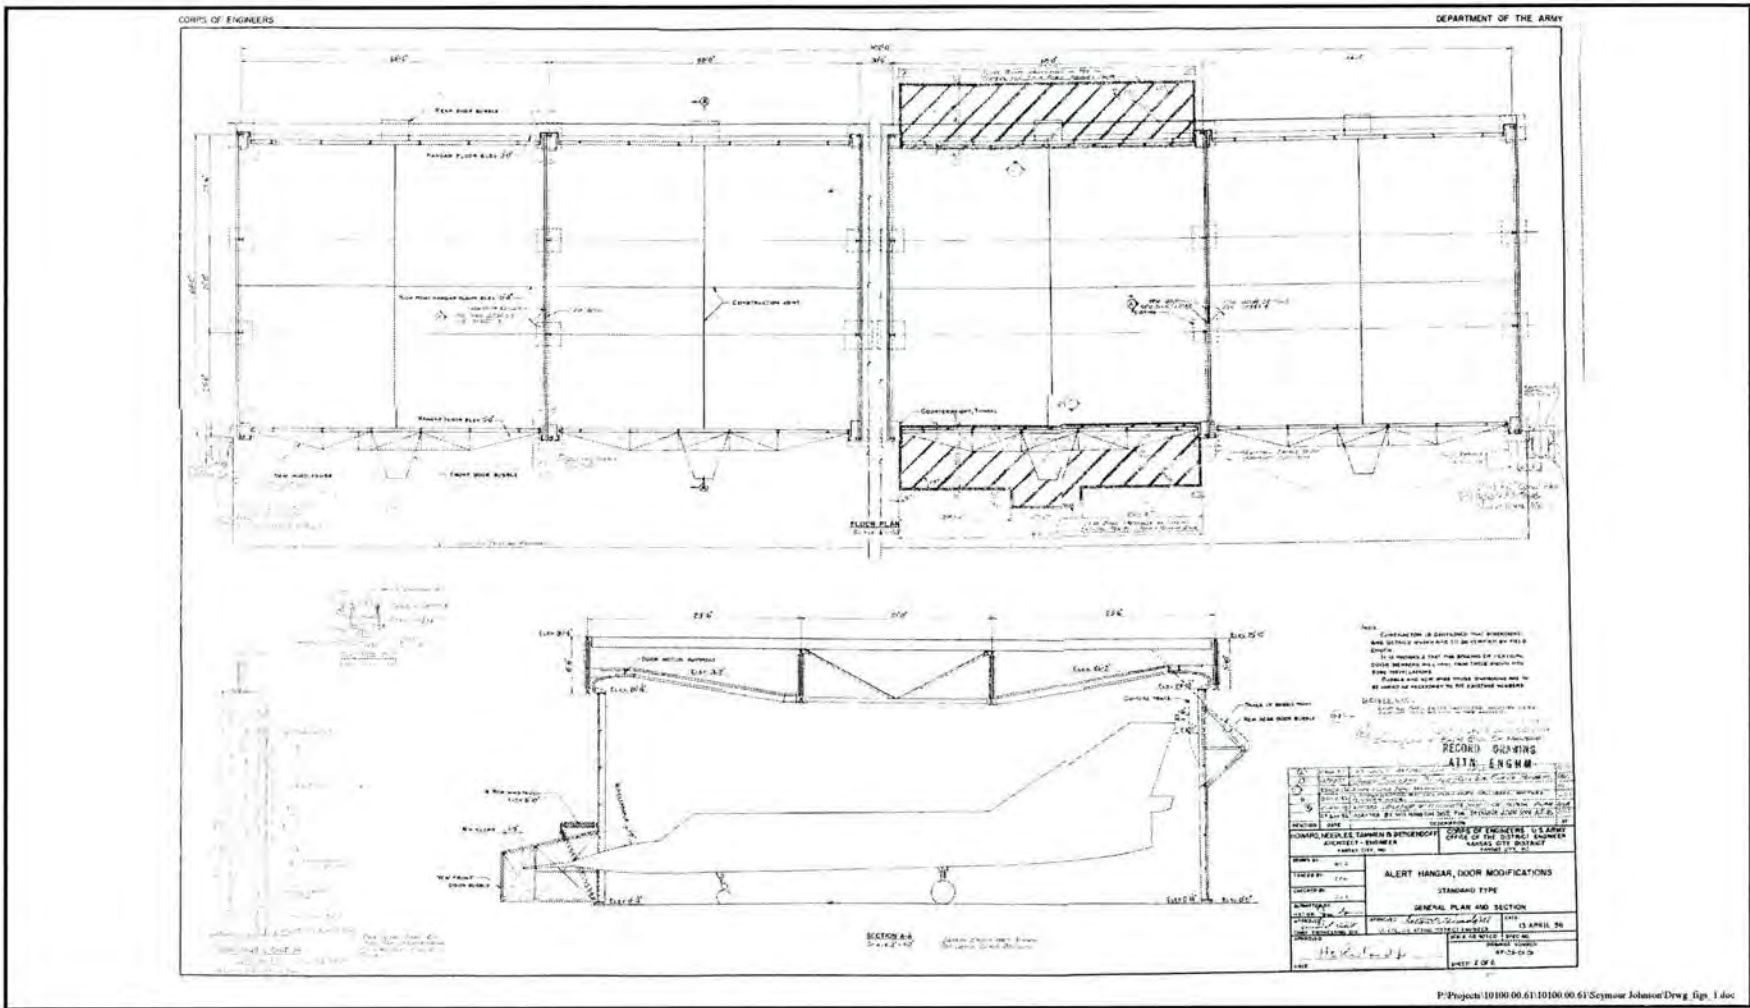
Building 5015—record drawing, alert hanger, door modifications, 1956 (Source: Seymour Johnson Air Force Base Civil Engineering Vault)
